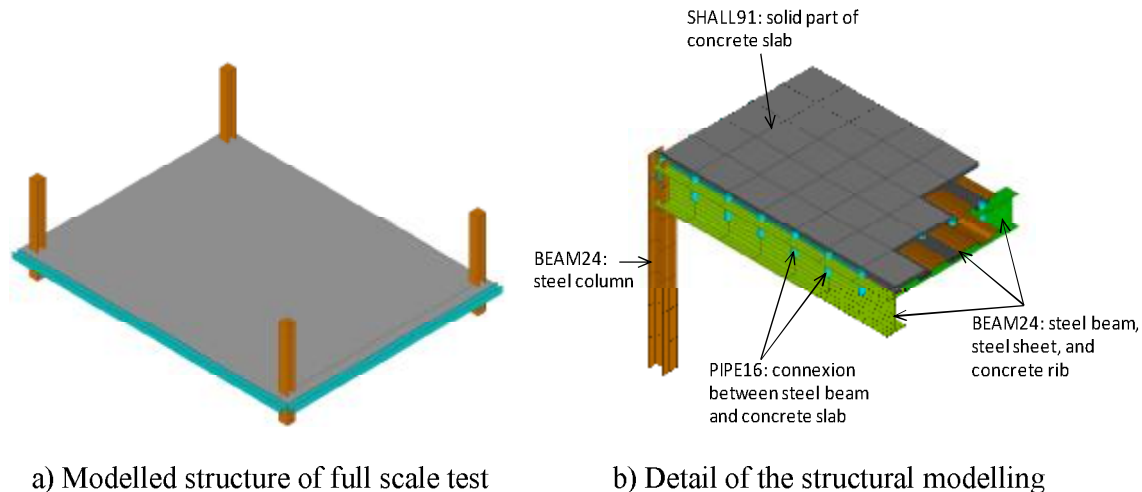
Numerical modelling for structural analysis of full scale ISO fire test
